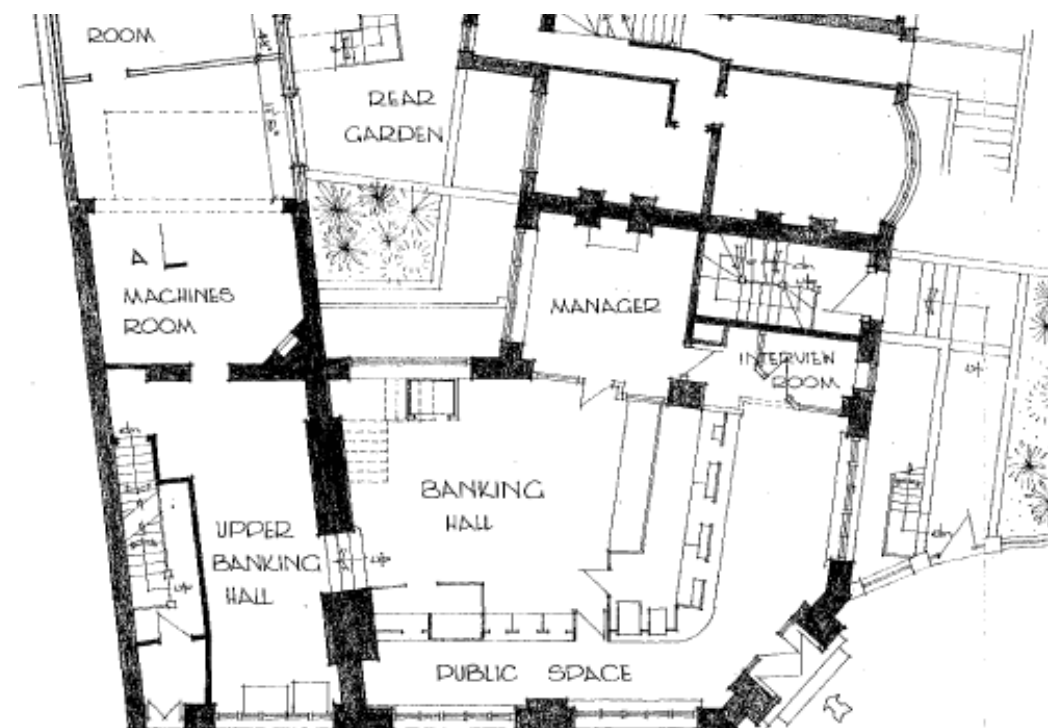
1979 Proposed ground floor plan, Planning Ref. HB2259
